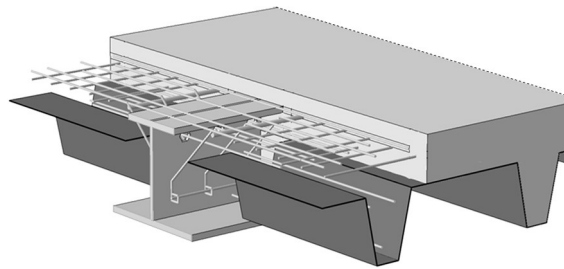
Example of a slim-floor system with asymmetric steel beam, reinforced concrete and concrete dowels – based on Braun et al. [3]
